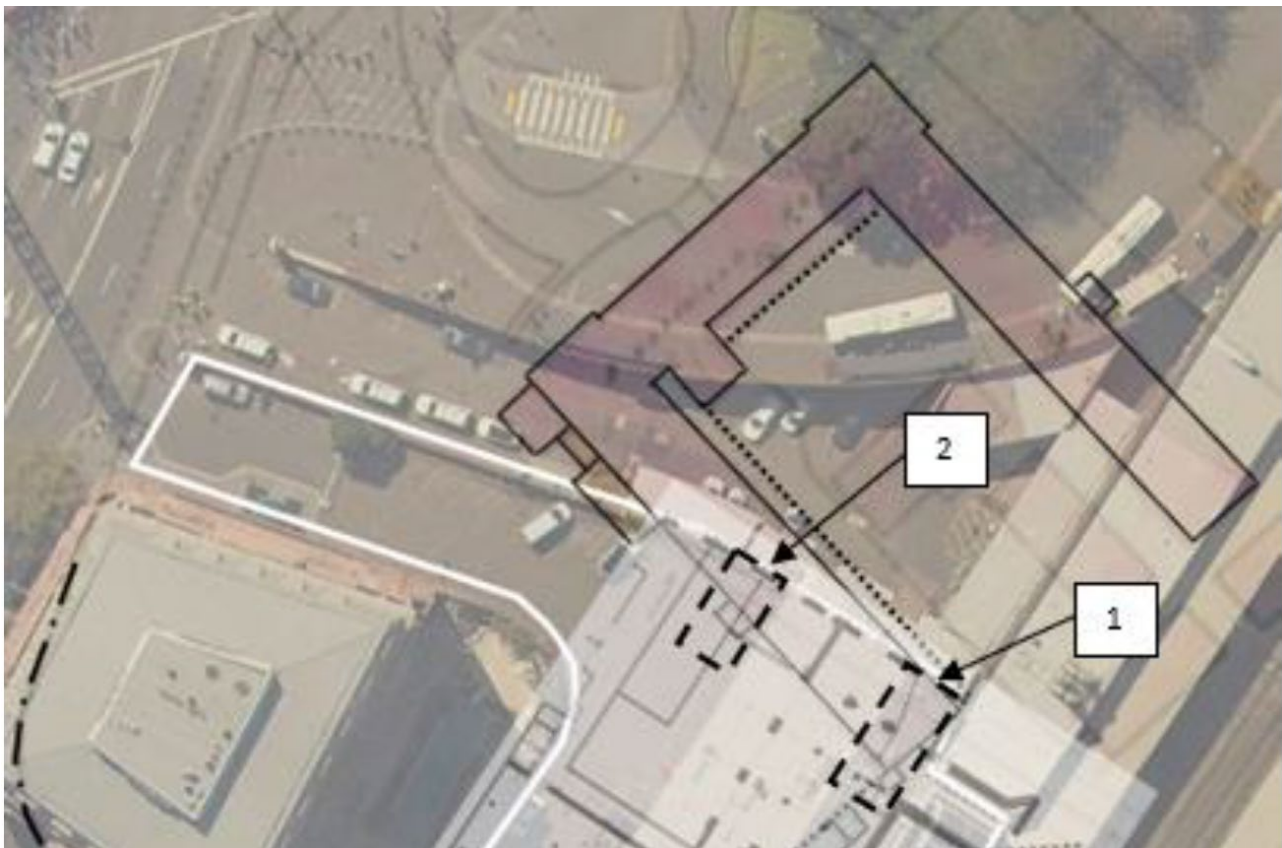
Proposed test trench locations overlayed with extant building plan. Where internal walls and columns are located within the trench the excavation will avoid these structures.
